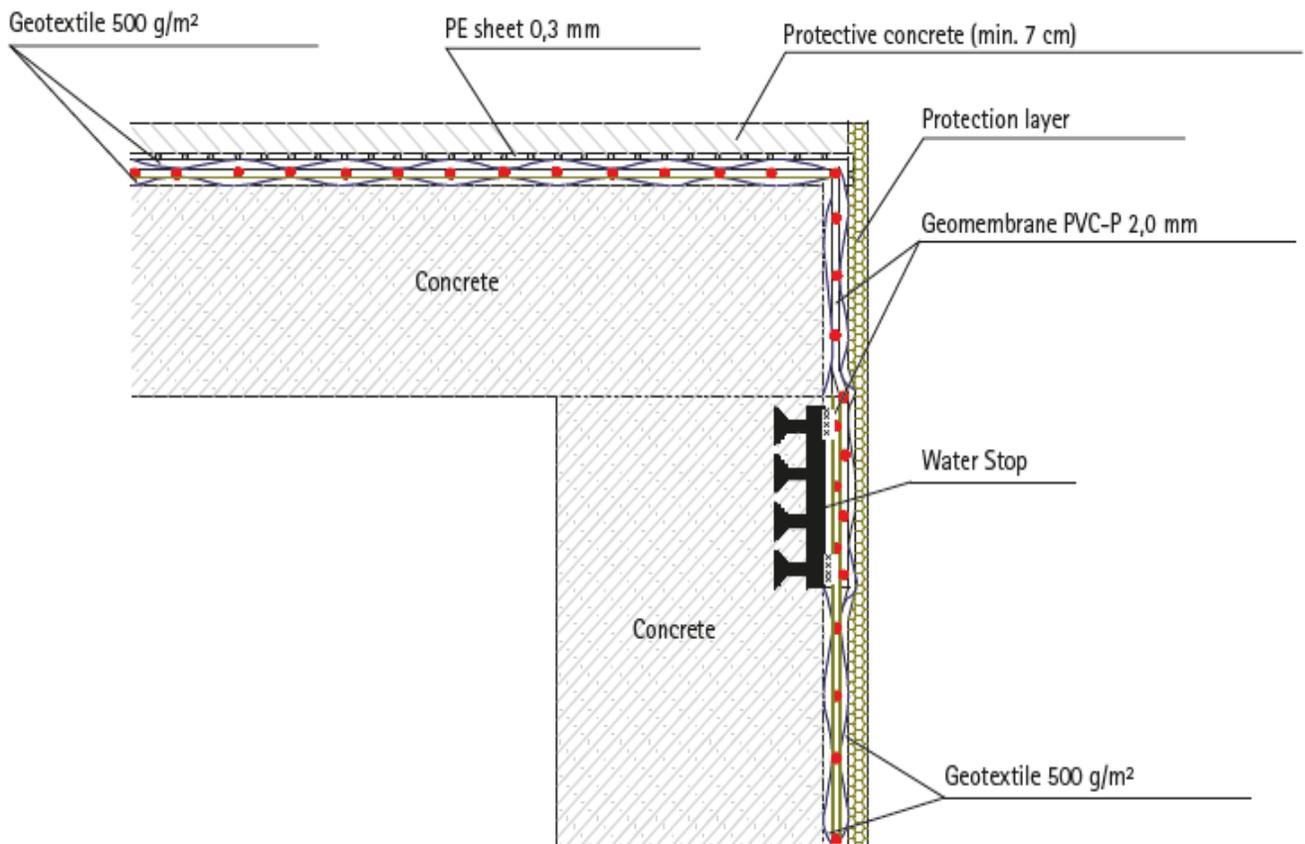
Waterproofing of the top slab with working space<sup>[16]</sup>
